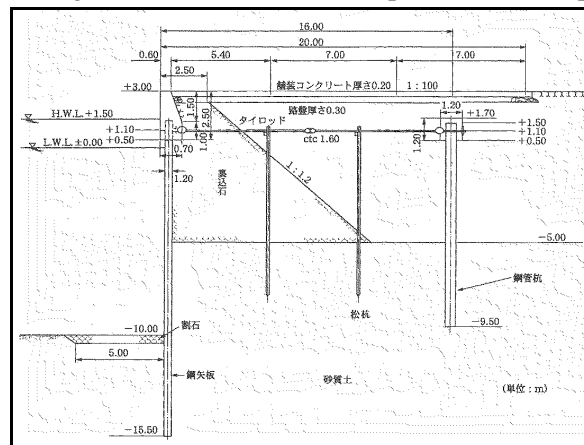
Example of Sheet Pile Quay Wall Design
